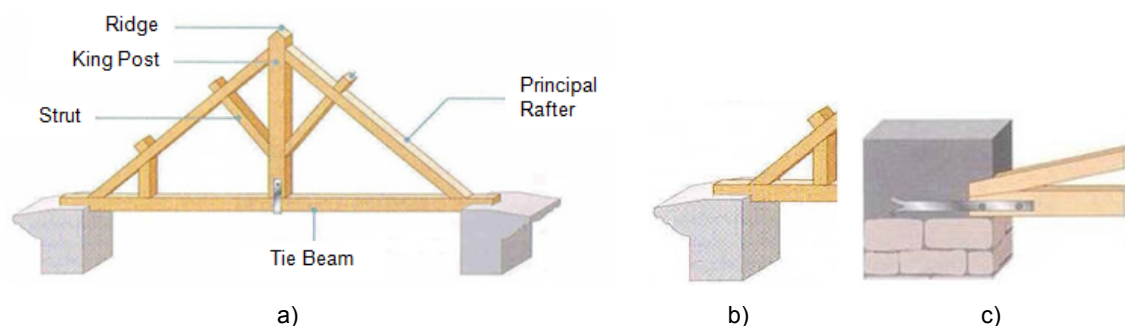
Timber roof structure (Appleton, 2003): a) Truss structure; b) and c) Example of connections to the masonry walls: b) Direct Support; c) Steel Reinforcement.
